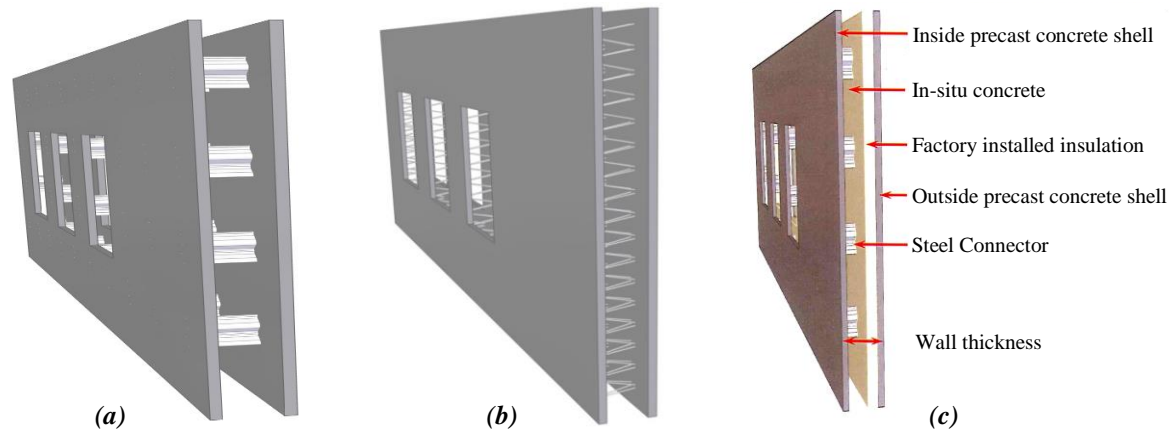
Double walls with (a) steel waves, (b) lattice girders and (c) sketch of insulated double walls
